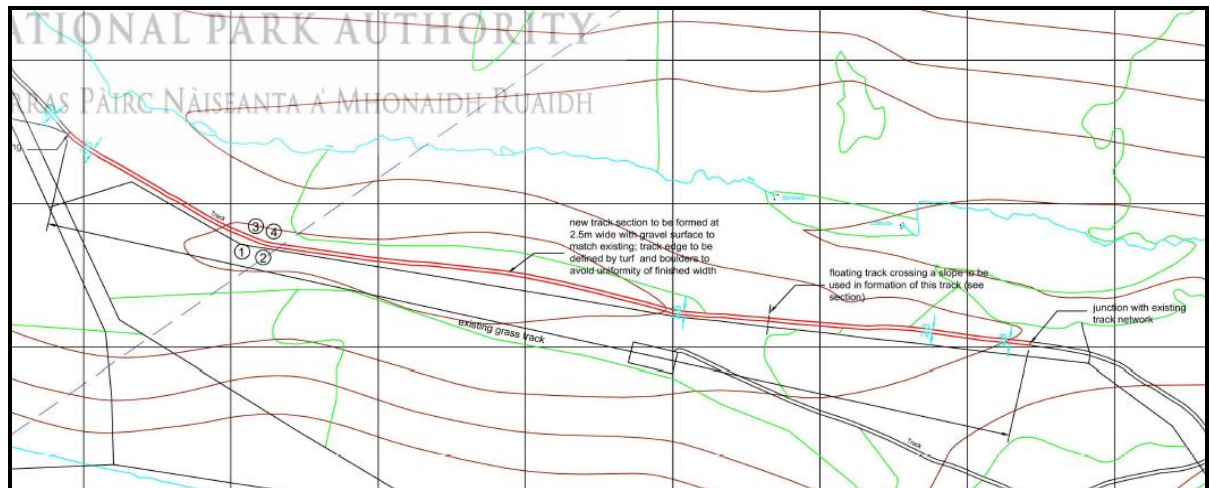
Section (b) layout (For illustrative purposes only) (Extract from Drawing I047573/03A)
